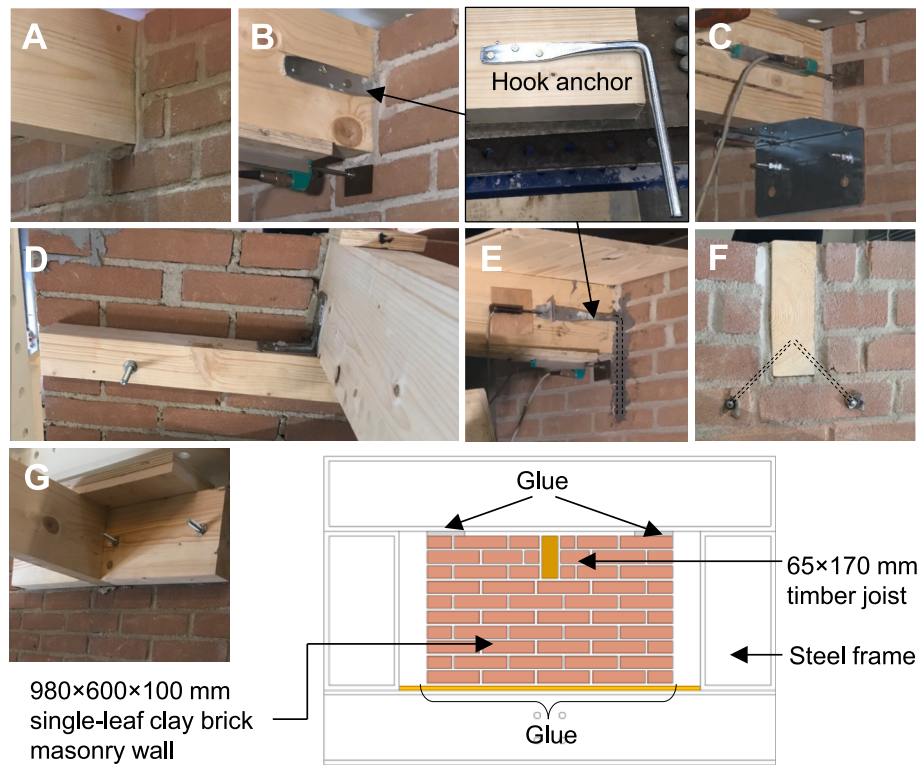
Overview on the 7 tested configuration: as-built with mortar pocket (A); as-built with hook anchor (B); strengthened with steel angle (C); strengthened with additional joist and steel brackets (D); strengthened with hook anchor glued into the wall (E); strengthened with two screws glued into the wall (F); strengthened with timber blocks (G); the principle and the description of a typical sample are also shown.
